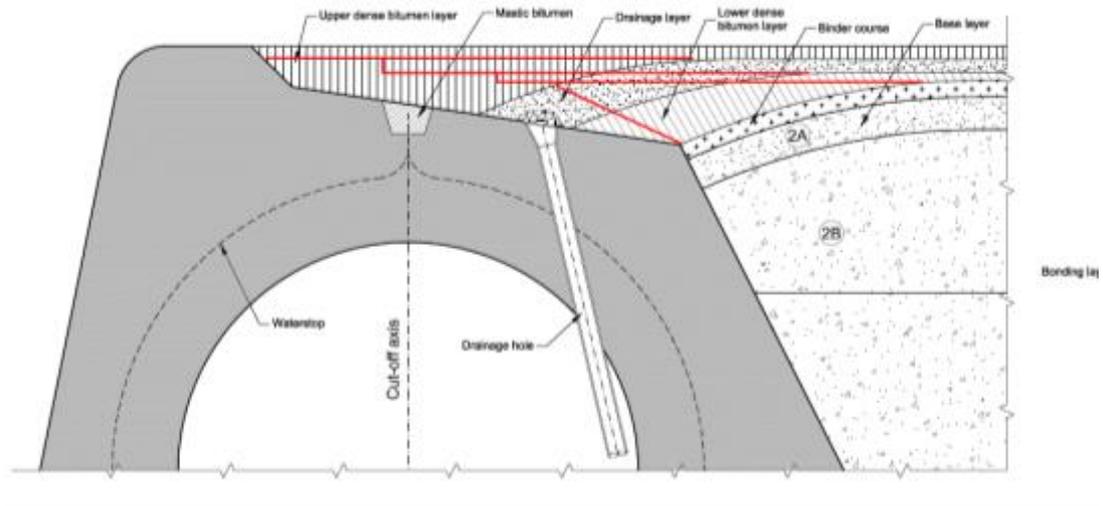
Basic Design - Gallery – Asphalt Face Connection Detail
